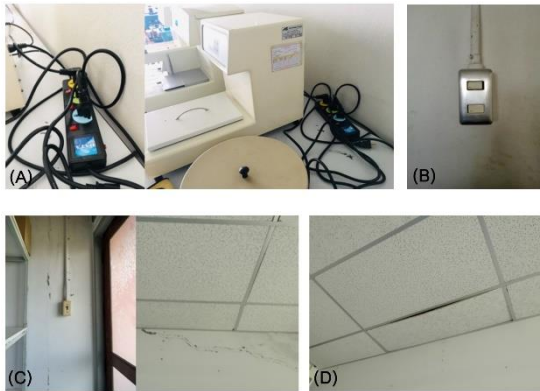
(A) Non standard wiring, plugs, sockets and use extension cord for over 8 hours, (B) Damaged electrical switch, (C) Damaged wall and (D) Damaged ceiling (before implementation)
